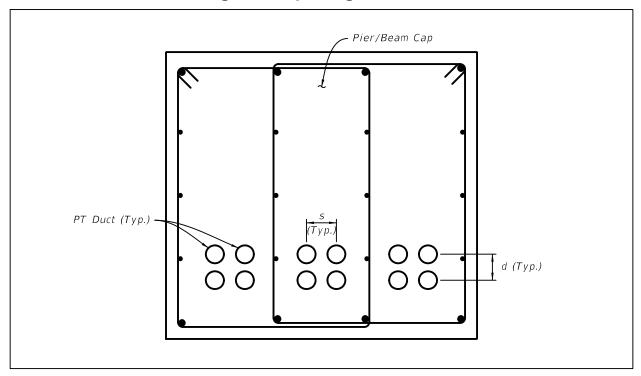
Section Through Post-Tensioned Columns Showing Duct Spacings
